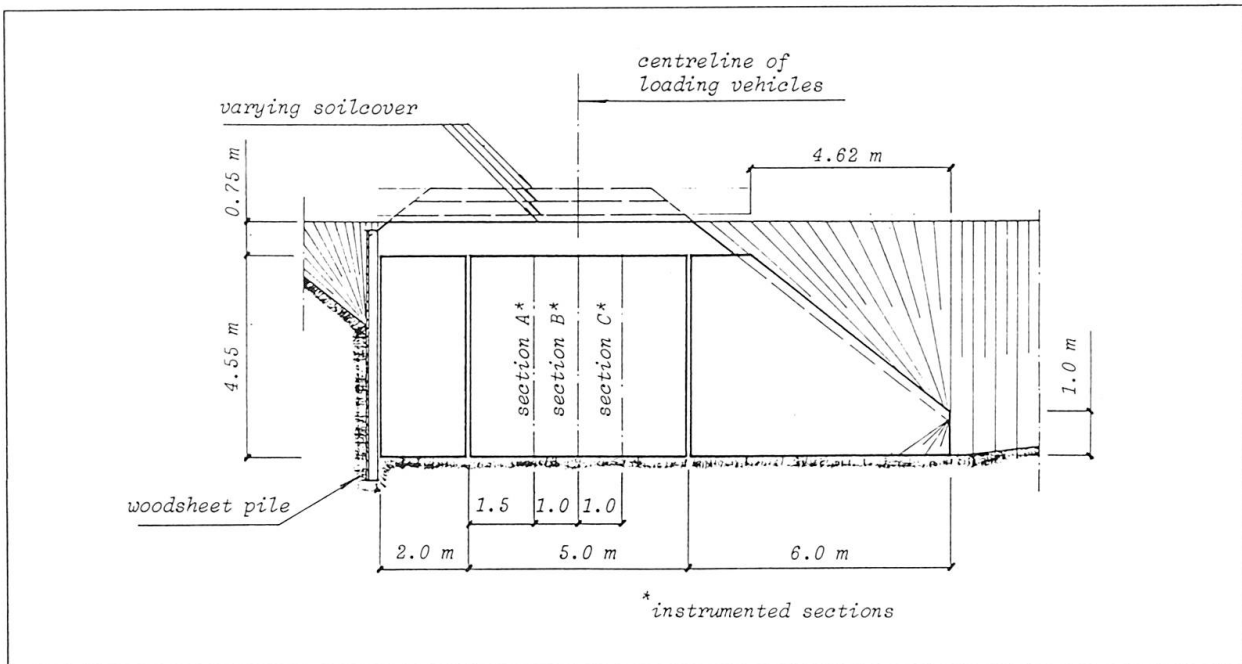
Longitudinal section through test culvert showing instrumented sections.
